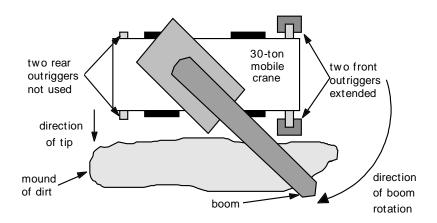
Top View of the Hydraulic Crane Showing the Direction of Tip
